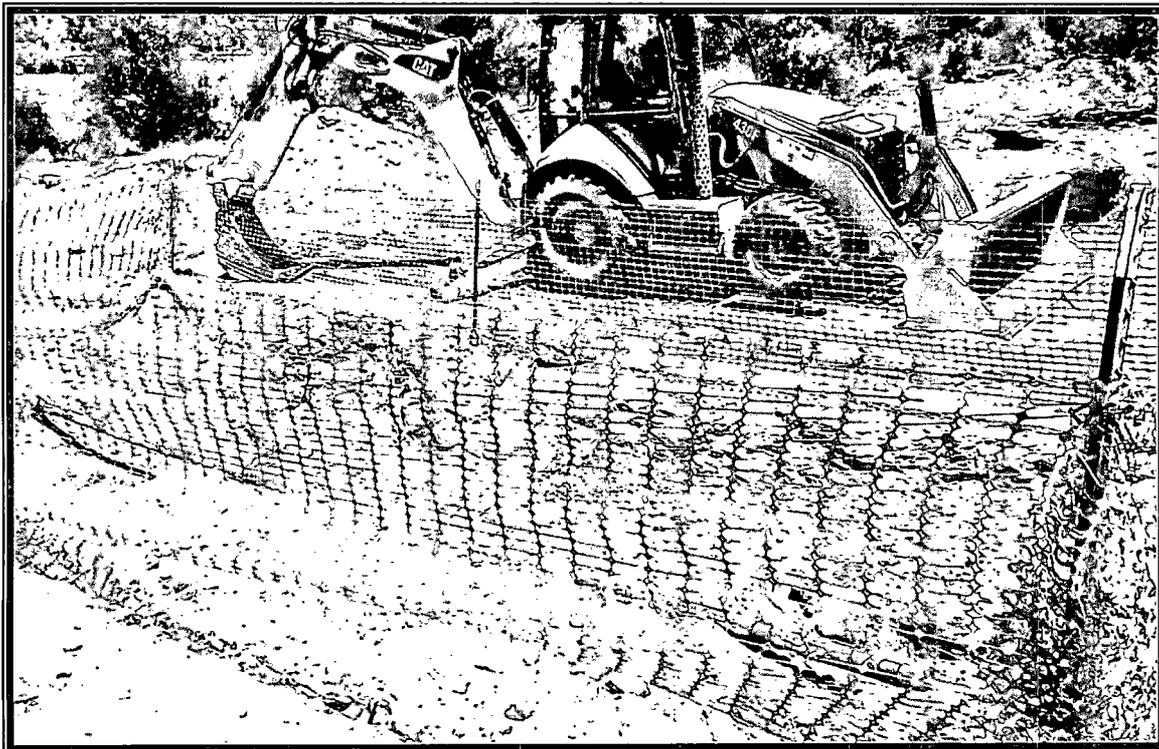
Final Excavation of the McKenzie #2 Well Tie Release site.
